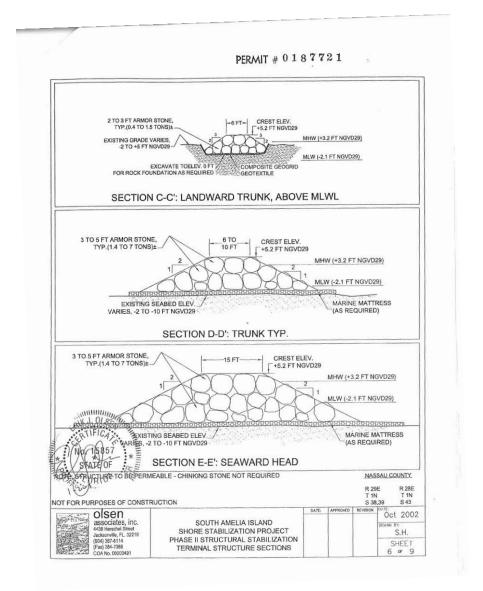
Amelia Island Terminal Groin Typical Cross-Section
